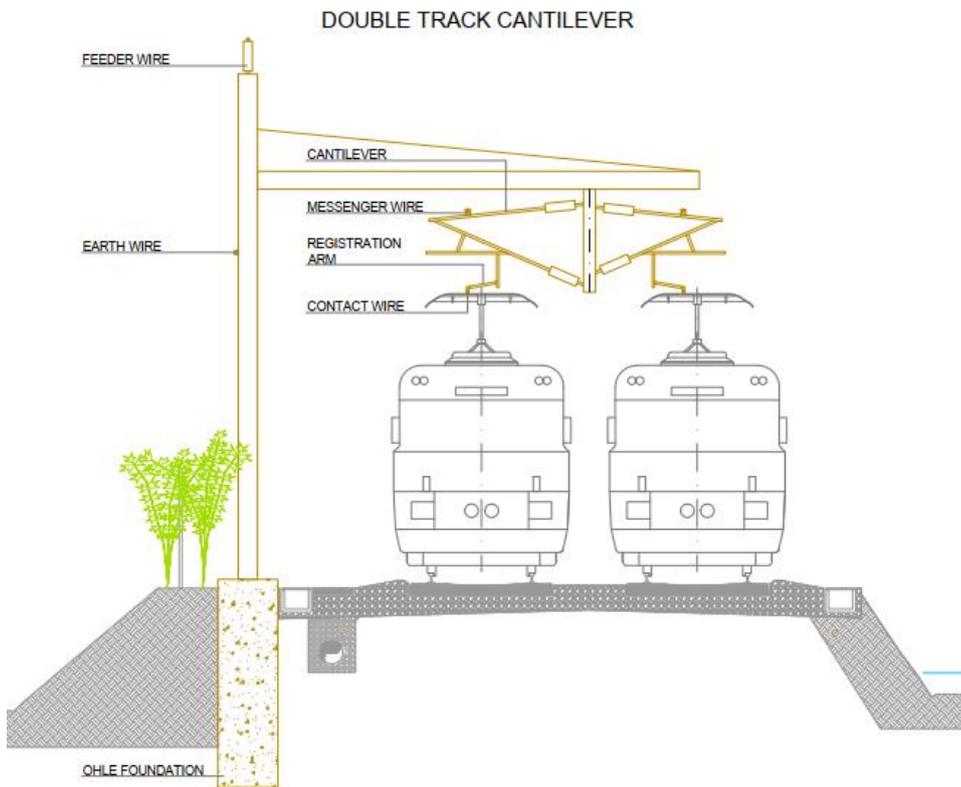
Typical OHLE arrangement in two track open route – Facing East.
